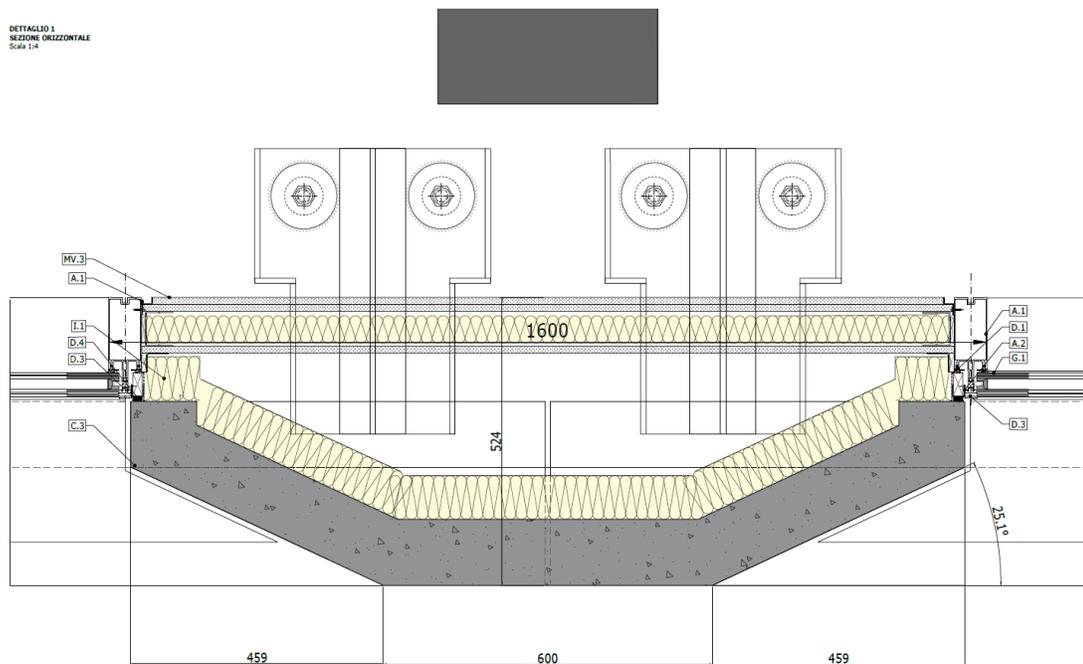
East Elevation WT-1C façade module typical- Prefab- Plan Detail 1. Source: Authc
